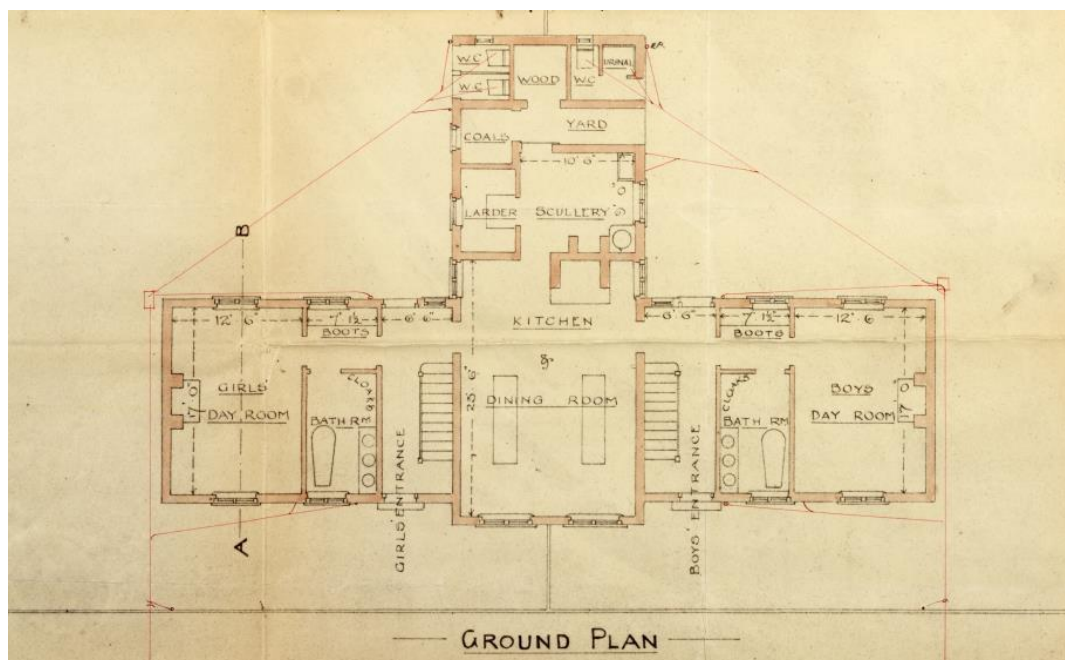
Ross Street Children's Home 1915: ground-floor plan (CA: CB/2/SE/3/9/3762)
